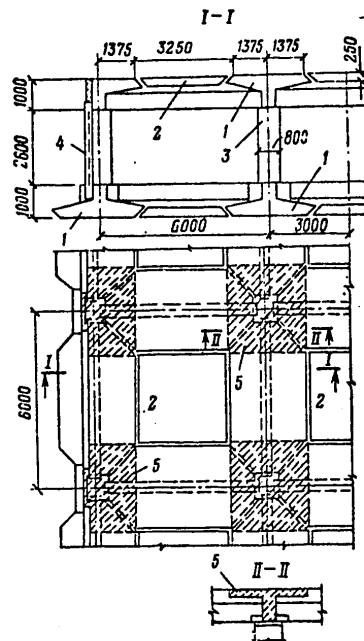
Structural diagram of a built-in shelter with ceiling made of continuous T-beams.
